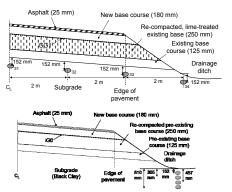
Moisture sensor (a) Horizontal profile (b) Vertical profile below the pavement at FM 2 site
